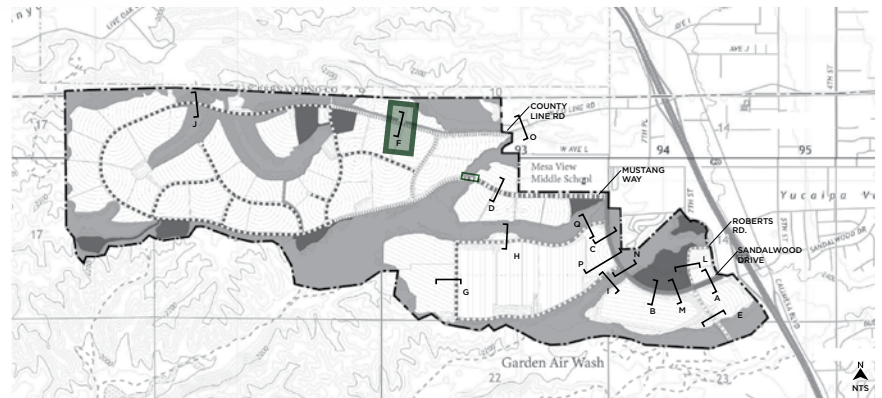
ENLARGEMENT DIVIDED COLLECTOR STREET SECTION F
